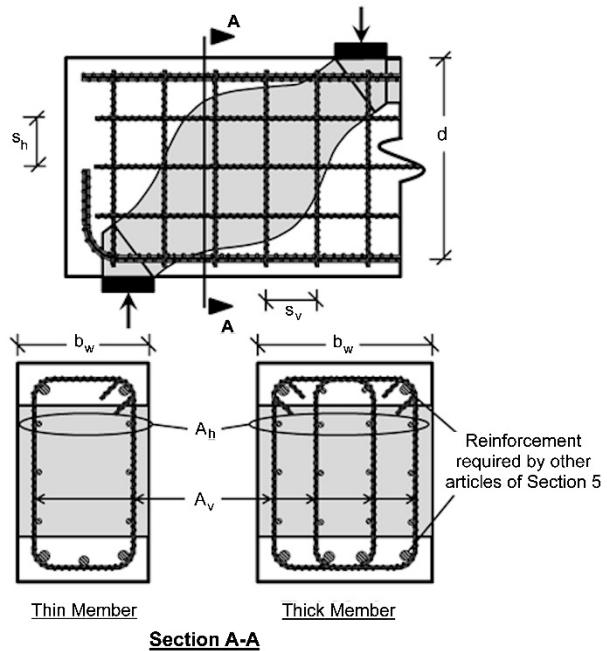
Distribution of Crack Control Reinforcement in Struts
